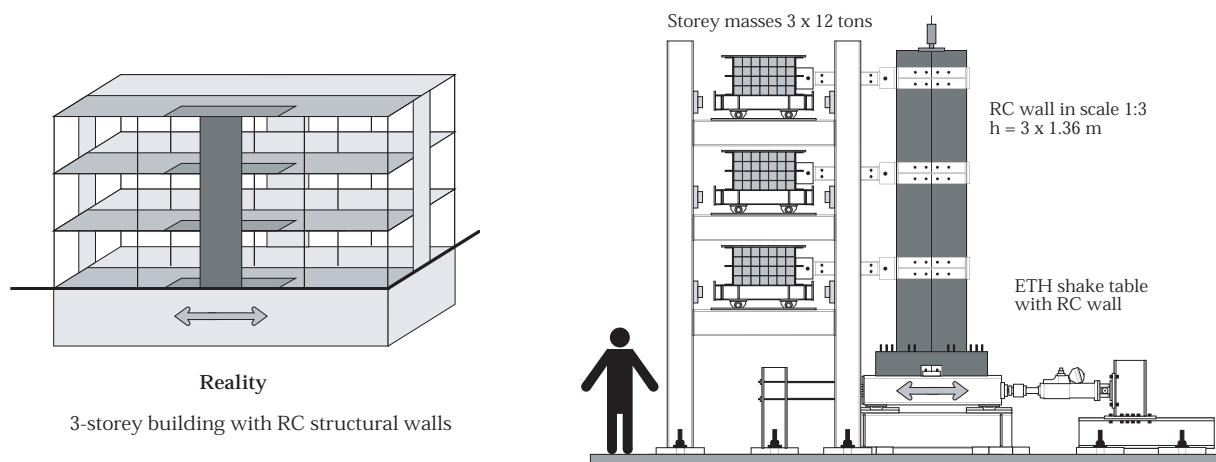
Reference building with structural wall system and the corresponding reinforced concrete test wall in scale 1:3 with test set-up.
